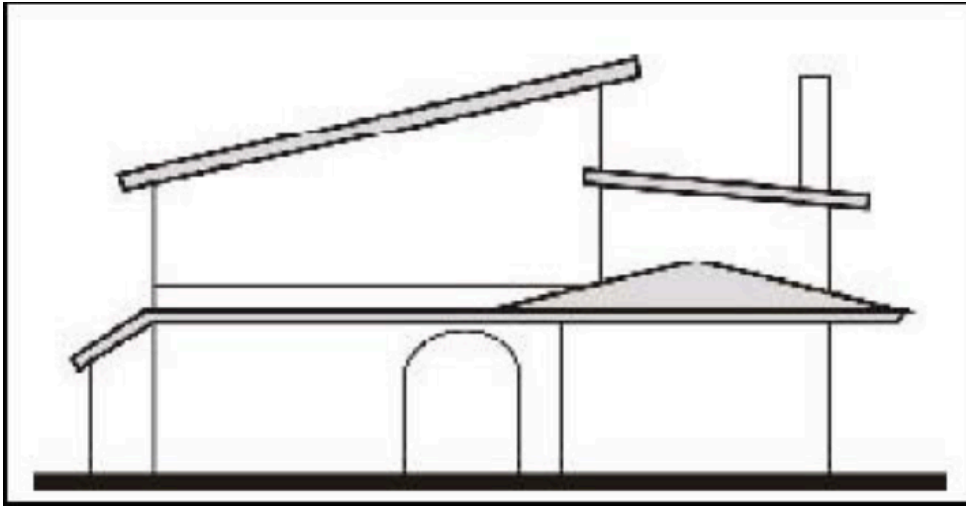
Roof elements with varied slopes result in a building that looks confused and unattractive.
